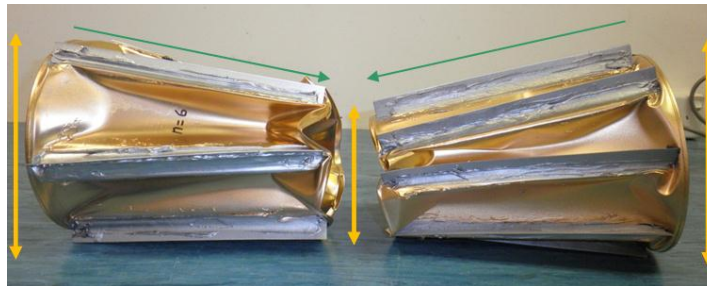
Fully stiffened specimens after collapse, $n=6$ (left) and $n=8$ (right).
